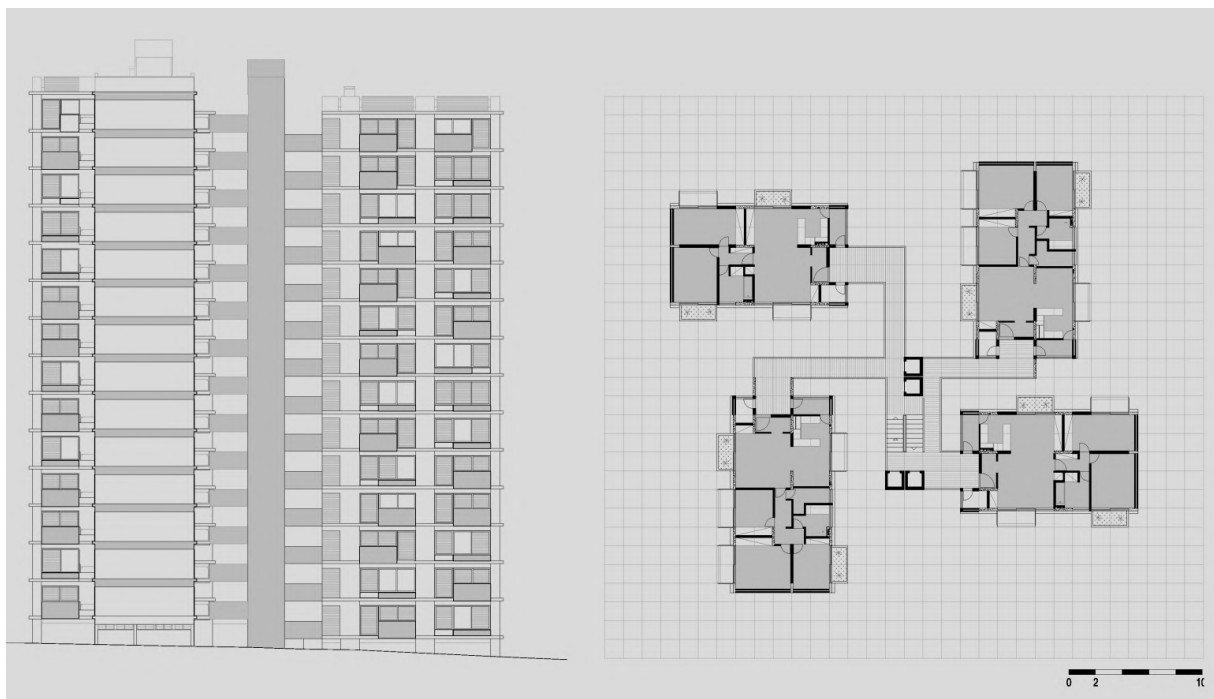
Facade and Plan of the fifteen-story Towers FSC, ILR, *Atelier*, Queijas, Work session 31.07.2018
